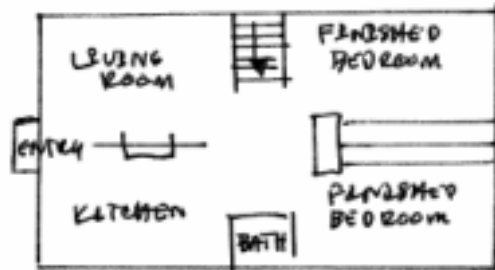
, Sketched Levittowner floor plan, Walter Lehman
